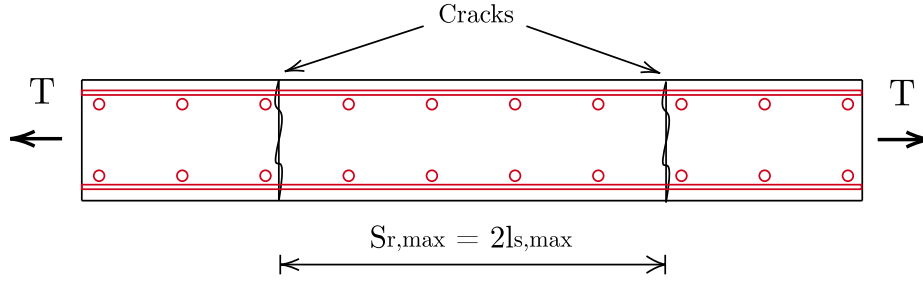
Plan-view illustration of concrete cracking and layout of reinforcing.
